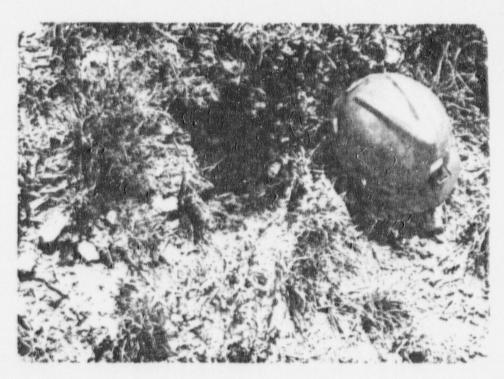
VIEW OF HOLE IN DAM. NOTE: CRACKING OR HOLES ARE NOT CONTINUOUS.
